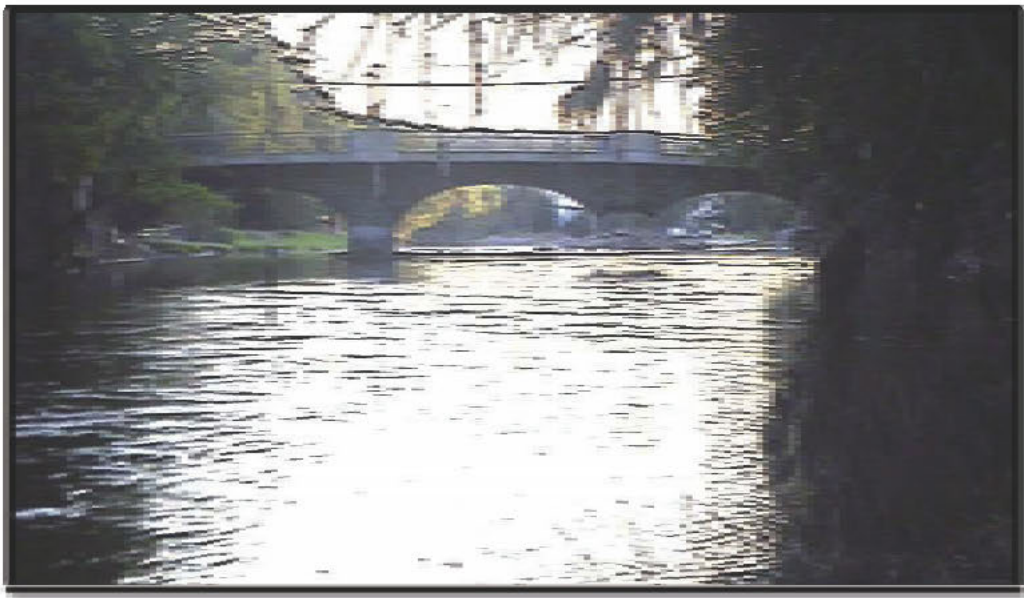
Bridge pier destroyed (near Flöha, on the Zschopau)
